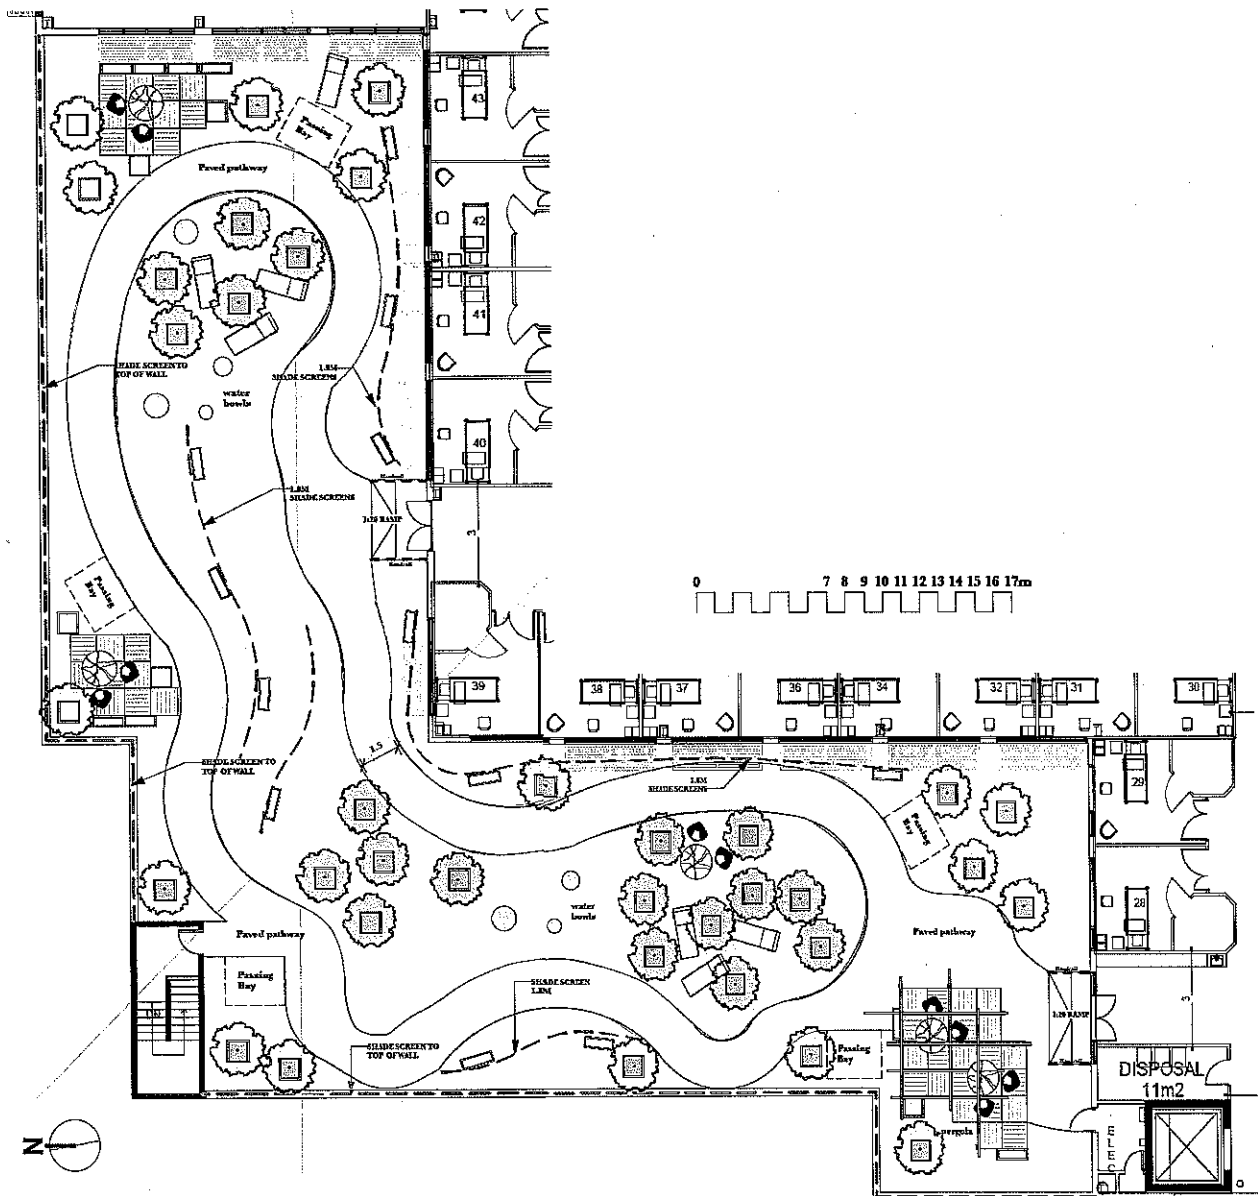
LANDSCAPE PLAN FOR EXTERNAL TERRACE
